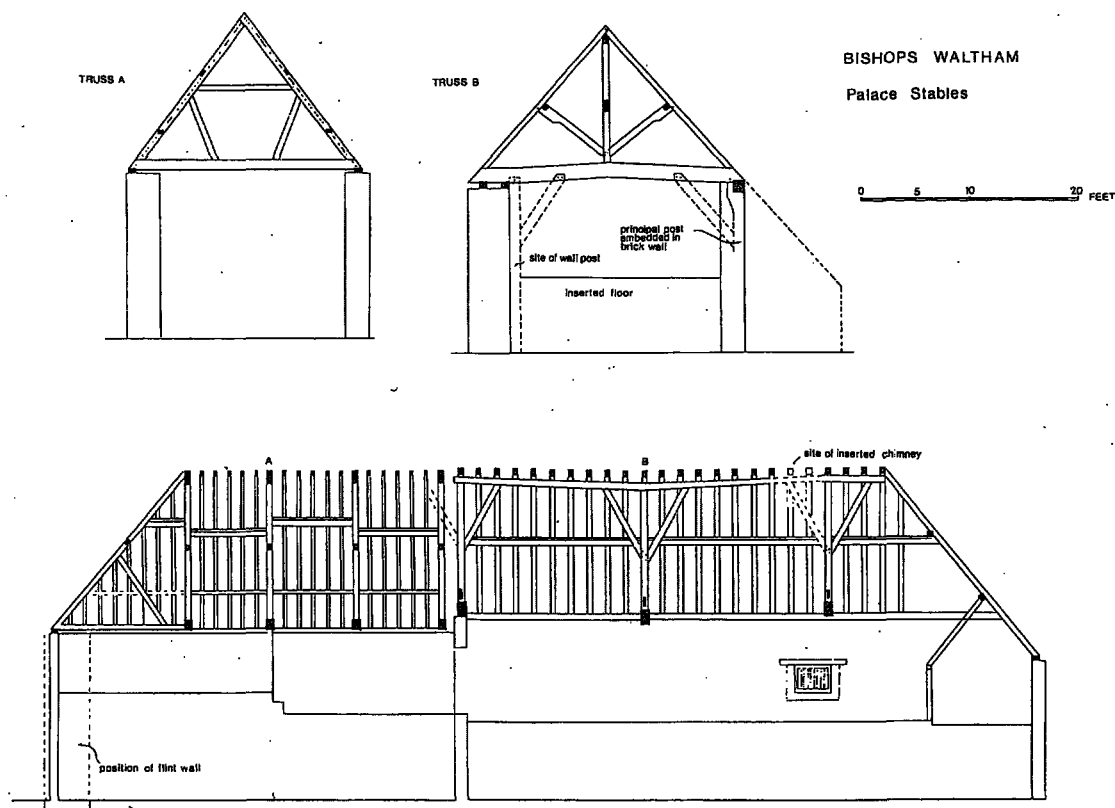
Sections of the 'Palace Stables' drawn prior to demolition (after Lewis 1985). Truss A is part of the post-medieval staggered-butt-purlin roof. Truss B is one of three king-post trusses tree-ring dated to 1300–15.
